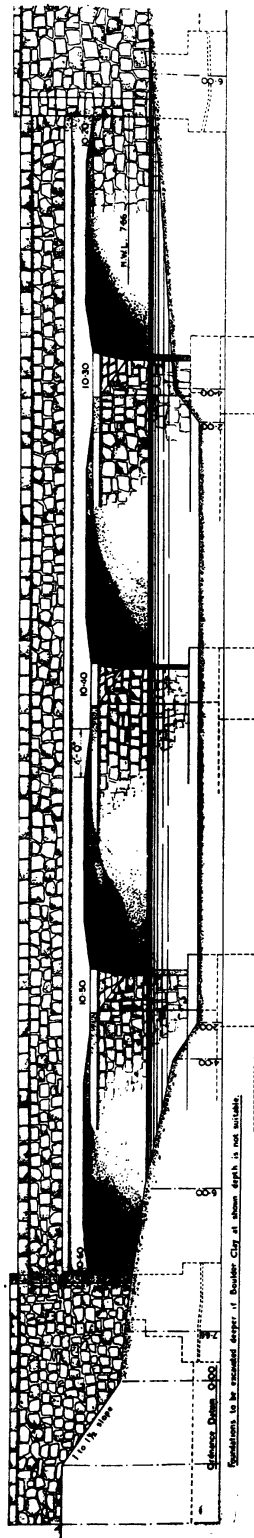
INVERNEILL BRIDGE: DOWNSTREAM ELEVATION.
